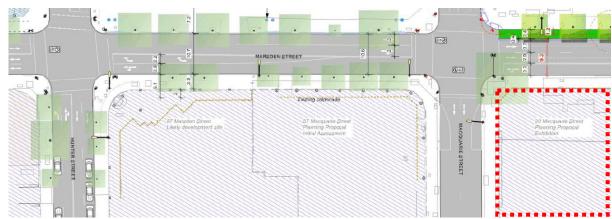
Marsden Street Cycleway Concept Design – opposite 20-22 Macquarie Street, Parramatta
